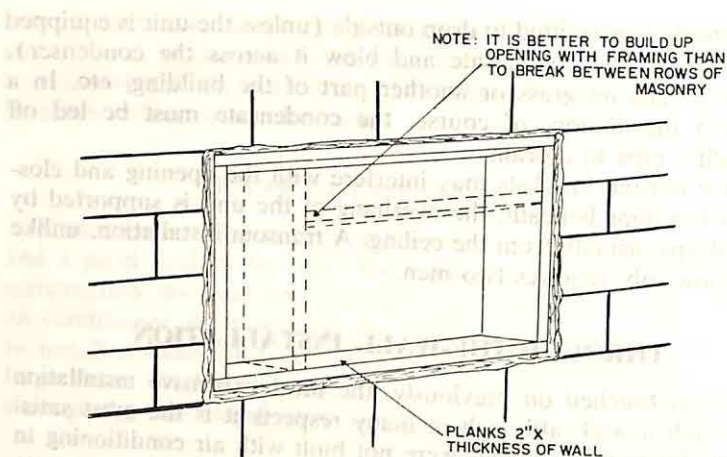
Framing an opening through masonry for a through-the-wall installation.
